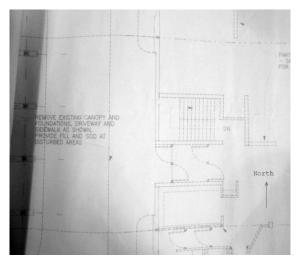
Removal plan for west portico, January 17, 1996 (Building plans)
